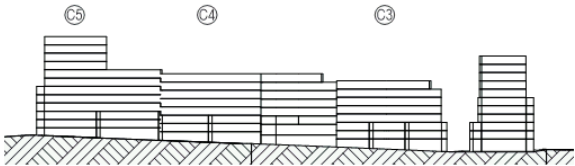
AREA C - ELEVATION - KING STREET SOUTH
